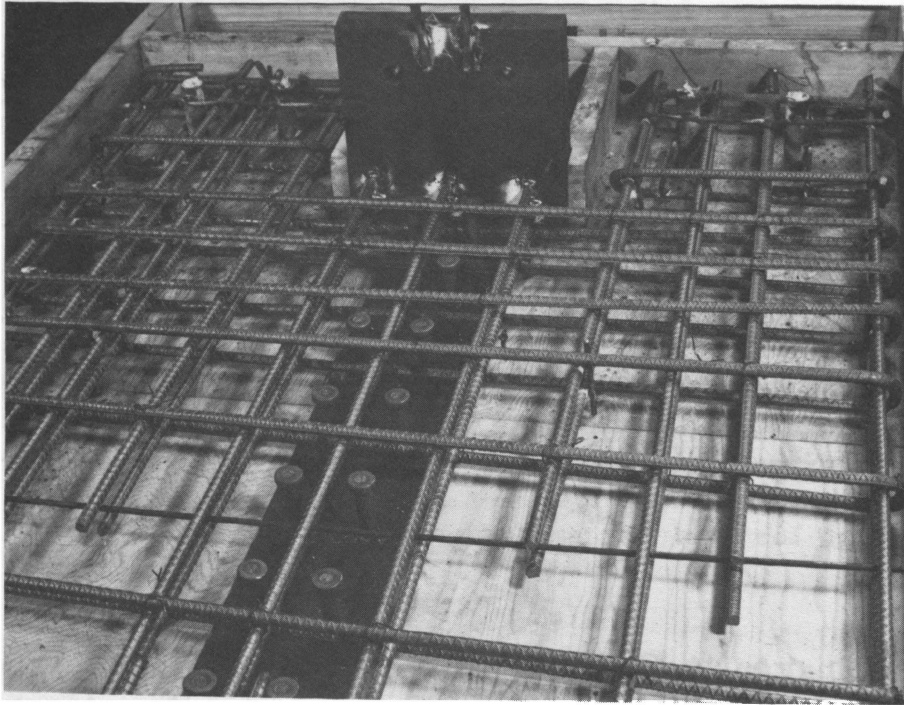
Reinforcement Detail for Beam with No Shrinkage Gap
